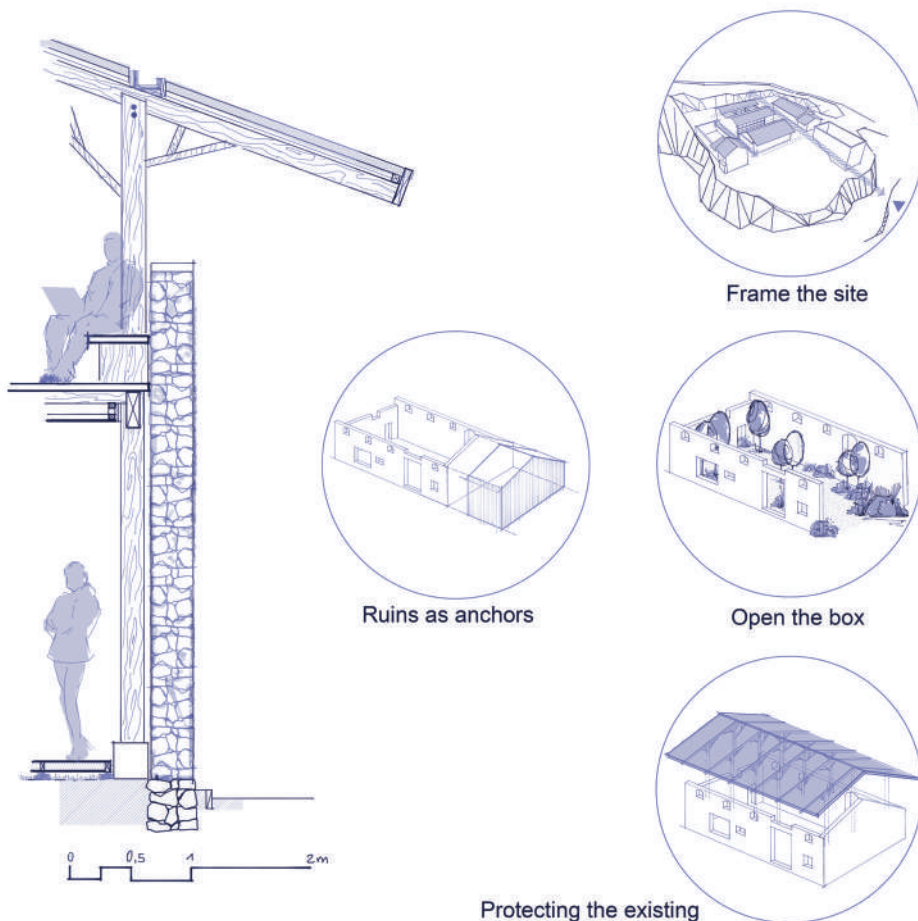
Structural cross-section: Ruins and detached roof (left) ; Architectural concepts (bubbles on right).
